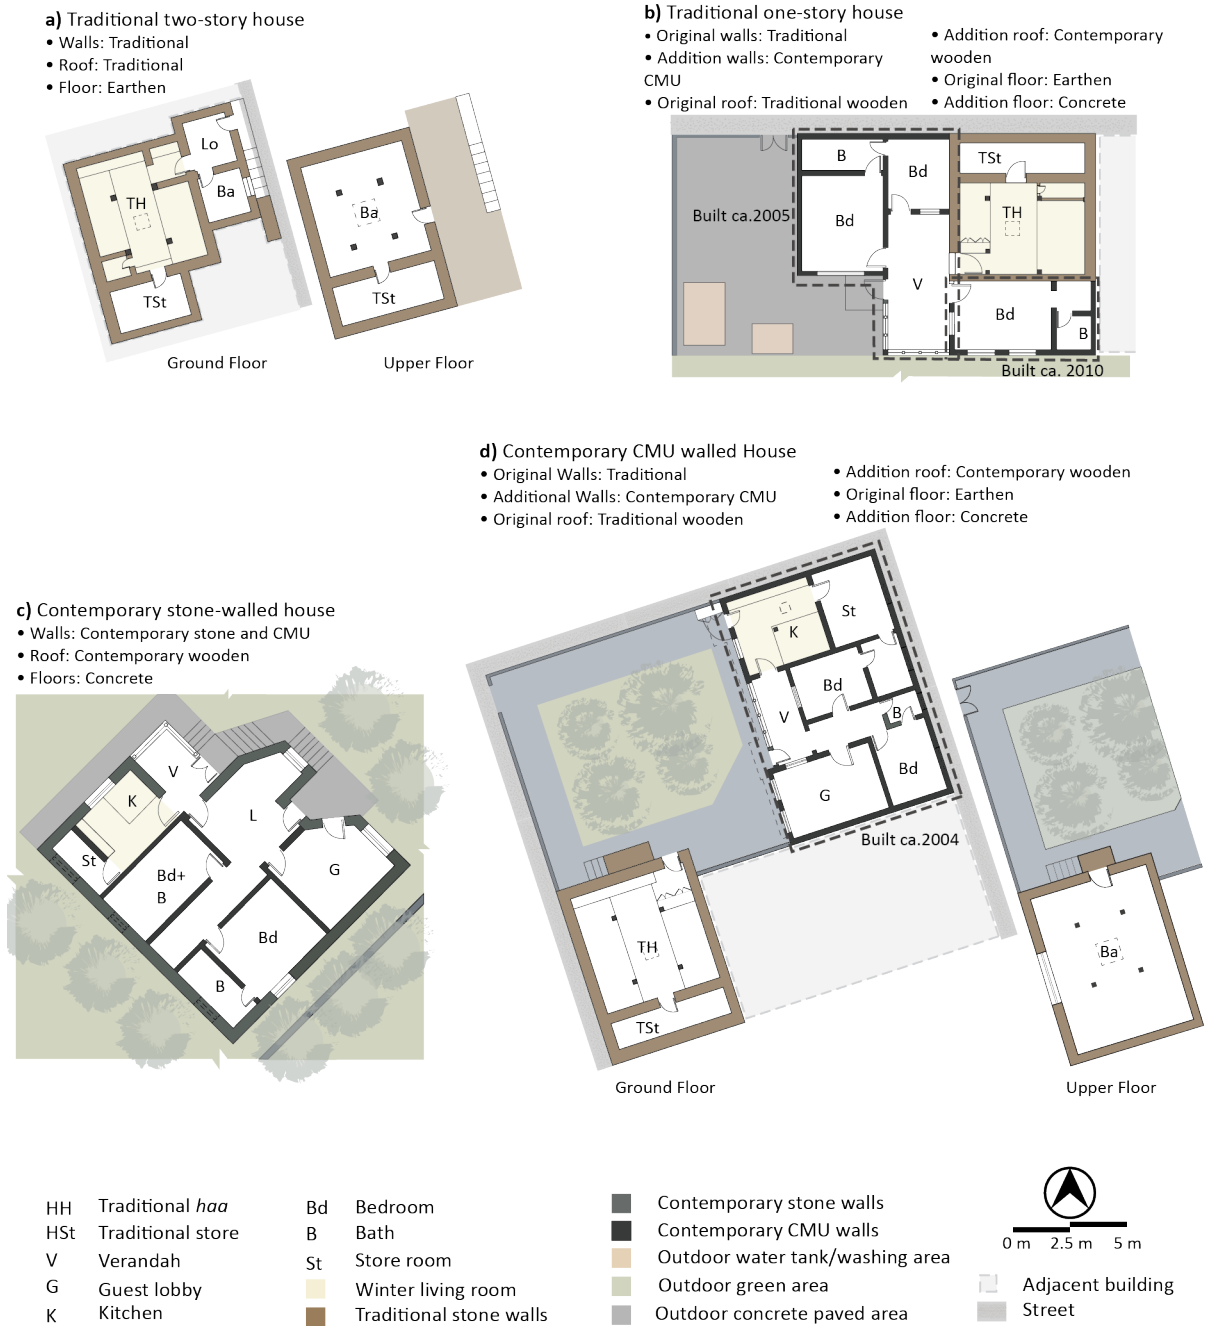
Floor plans of the sampled houses : (a) traditional two-story house, ca. 1600s; (b) traditional one-story house, ca. 1900s with subsequent contemporary additions in 2005 and 2010; (c) contemporary one-story stone-walled house, ca 2015; and (d) contemporary one-story CMU-walled house, ca. 2004, built as an addition to a traditional two-story structure ca. 1800s, which is no longer used for living (adapted from [1])
